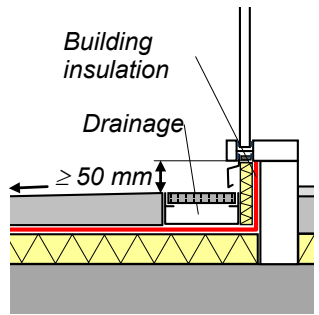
Layer model using the example of built-in curtain wall constructions
